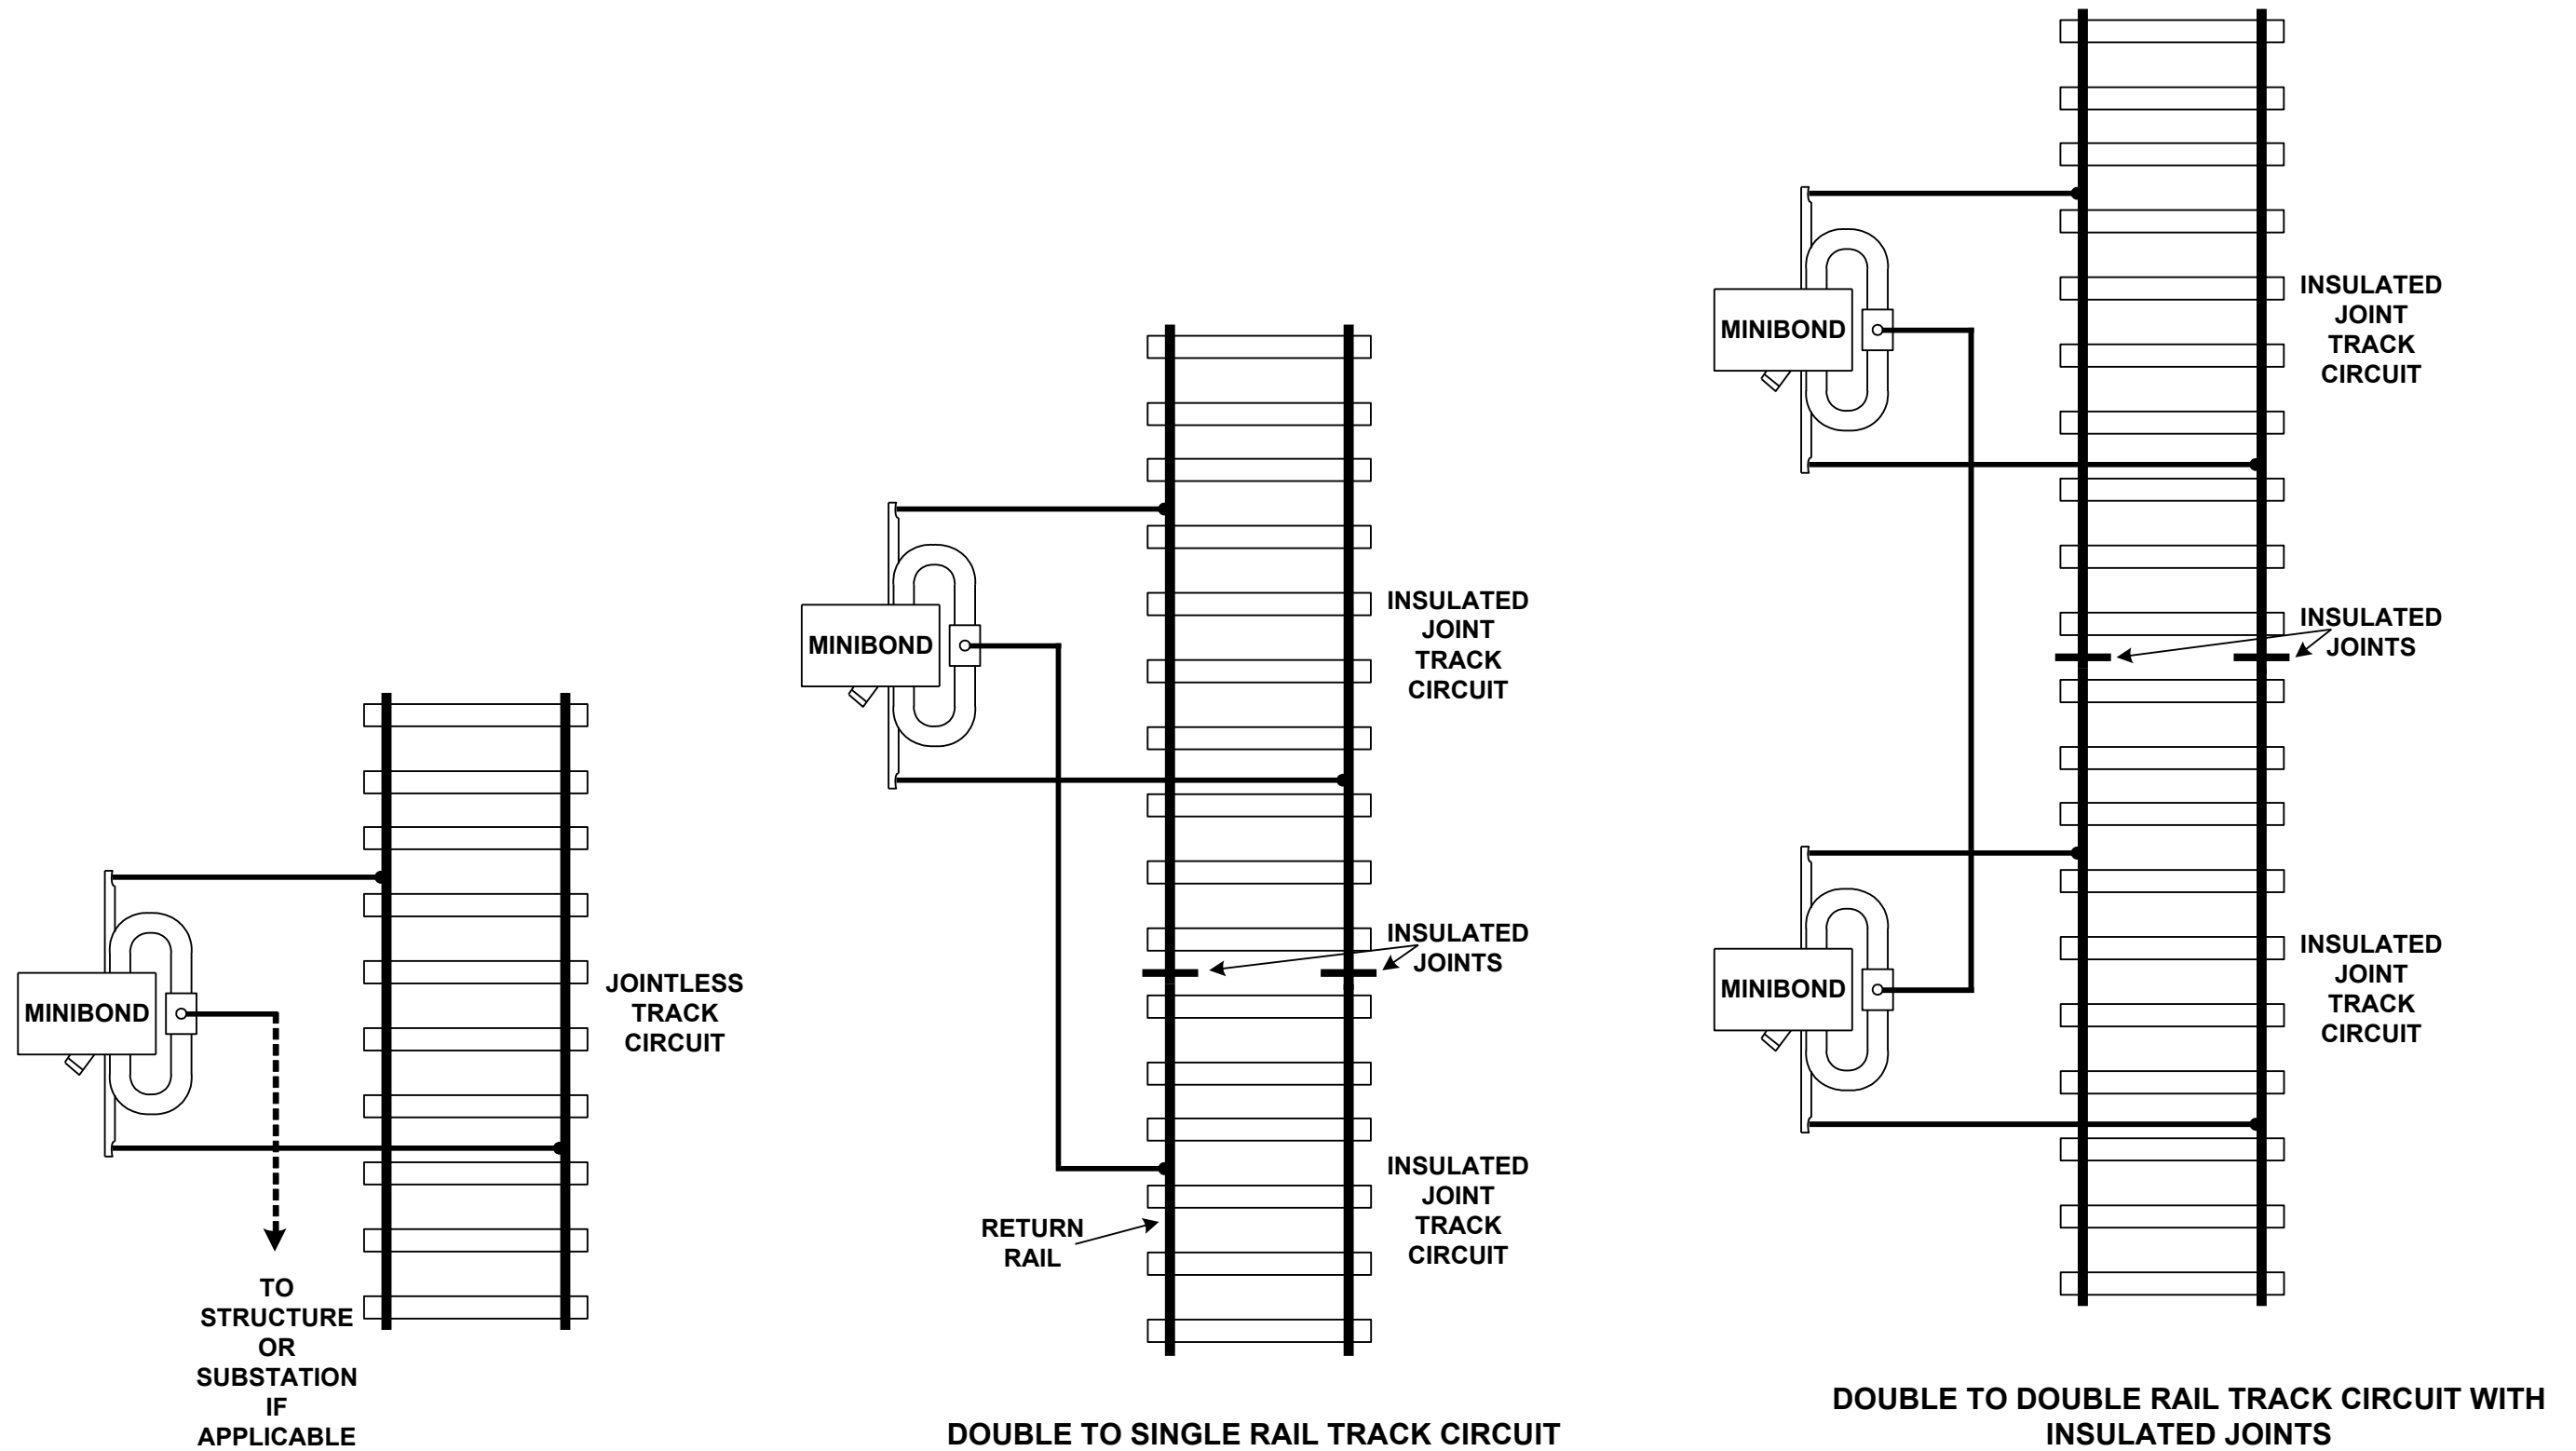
Typical Minibond Application (Mounted Outside Rails)
